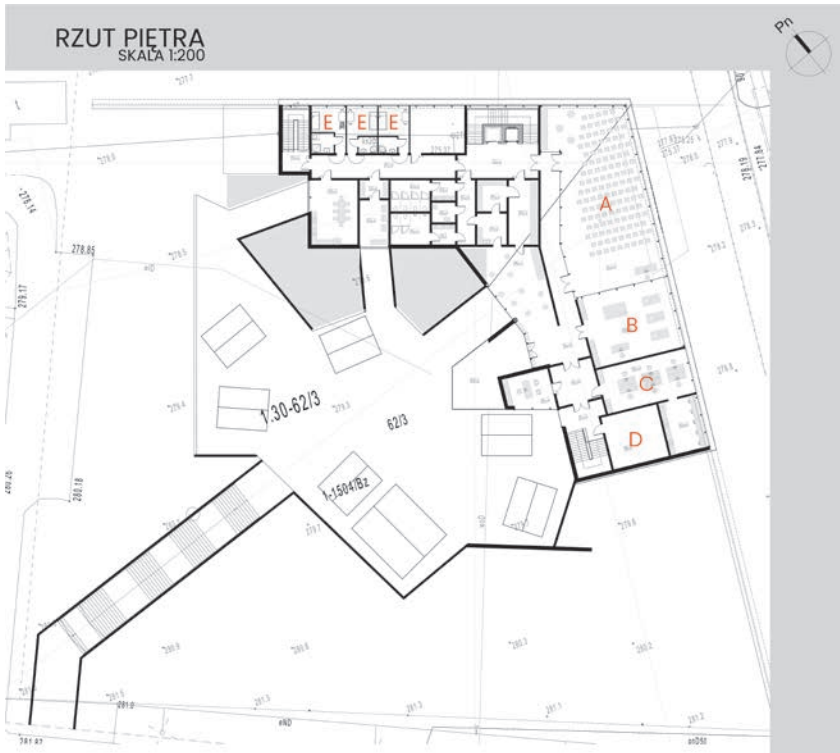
Project of the Archaeological-Historical Centre “Cherven’ Towns” – floor plan (A – conference hall; B – conservation lab; C – research lab; D – storage room; E – guest rooms)
